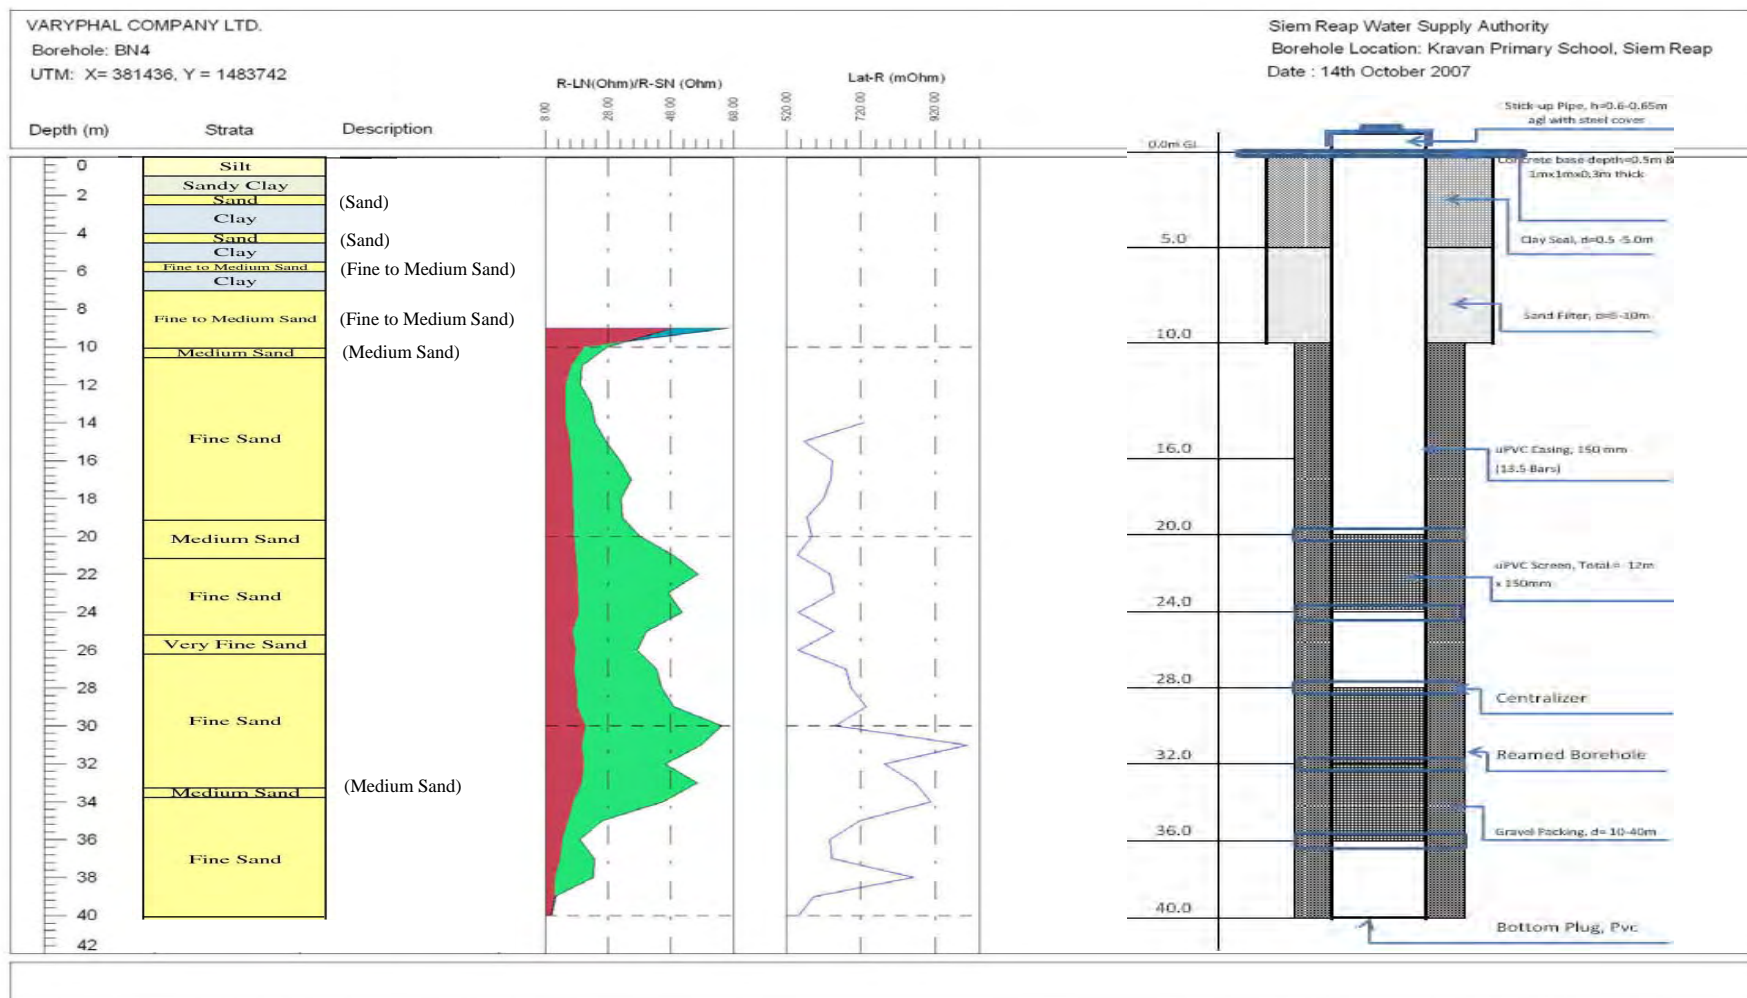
(9) Kravan Shallow Well: 40 m depth, Geological Column, Logging Curve and Well Structure
